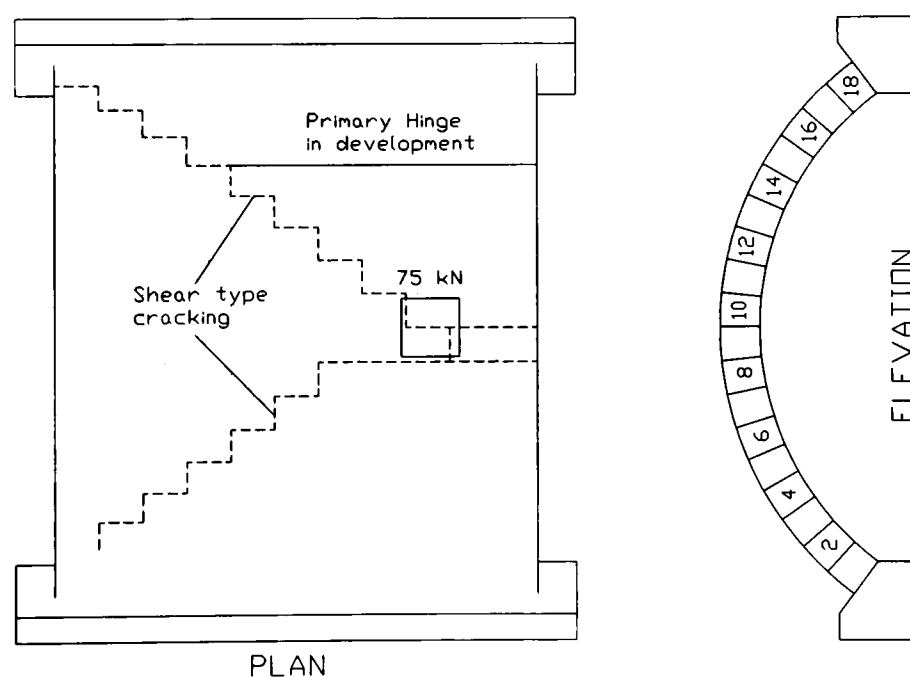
Crack pattern and failure mechanism of arch 1-1
